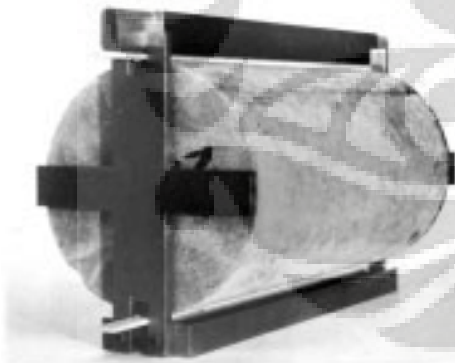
Jig for Aligning Concrete Cylinder and Bearing Strips
